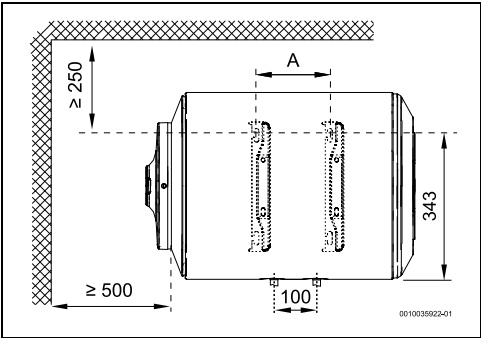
Dimensions in mm (wall mounting, horizontal installation, TR1000...H)
